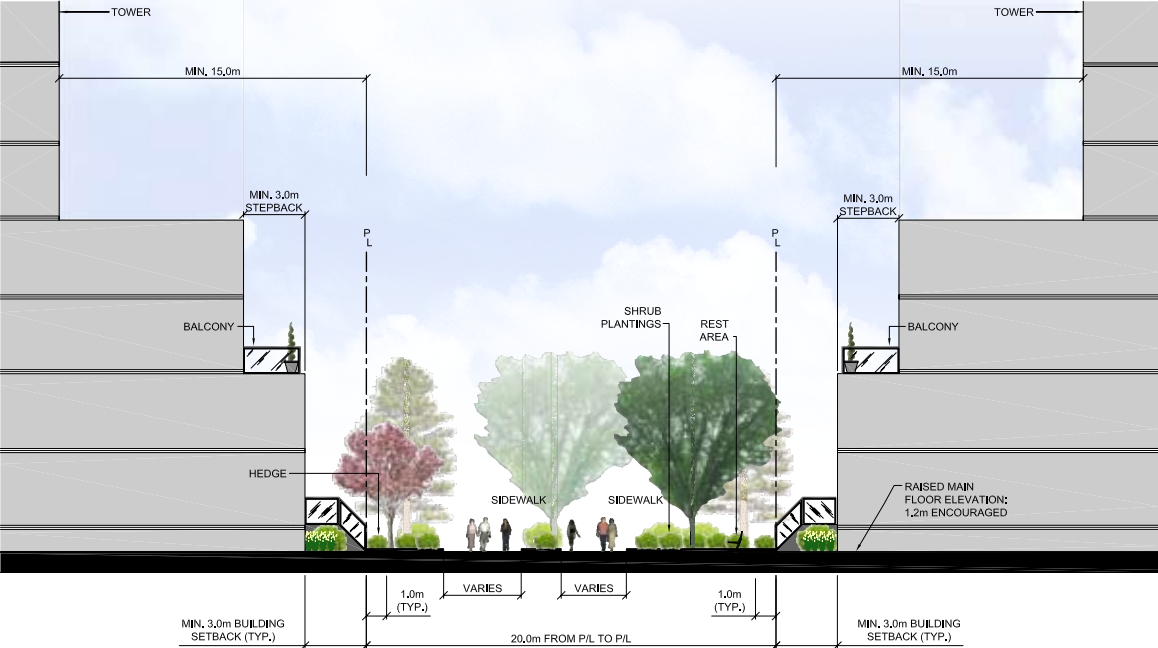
Section: Possible built form of 'Rescaling the Grid'
